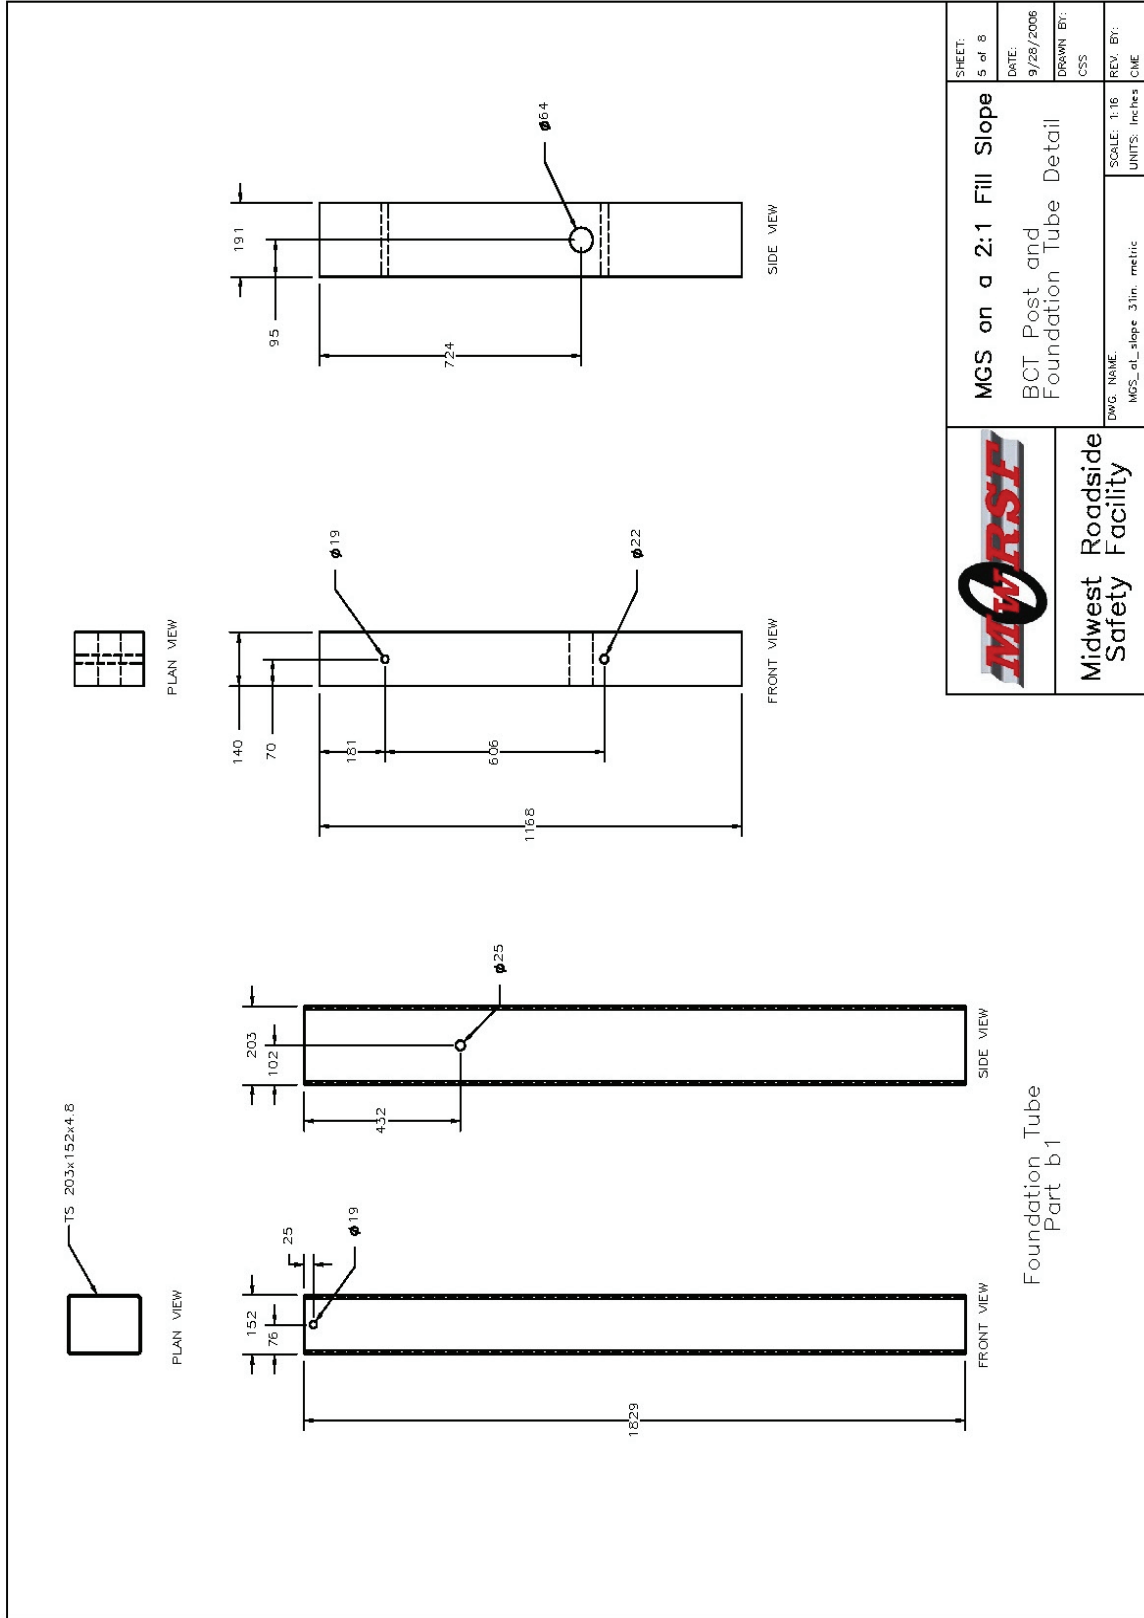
Post and Foundation Tube Details, Test No. MGS221-2 (Metric)
